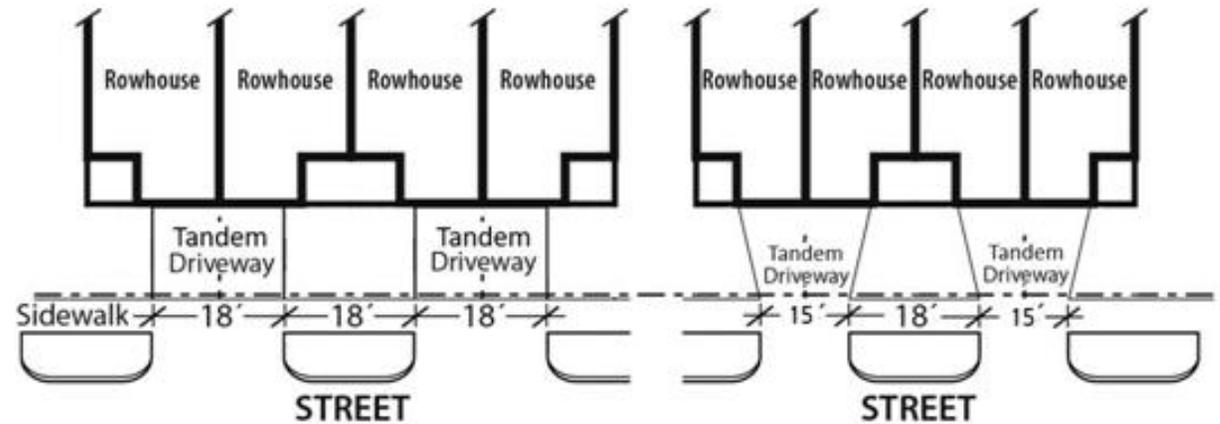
Townhouses/Quadplex with Paired Driveways/Garages
